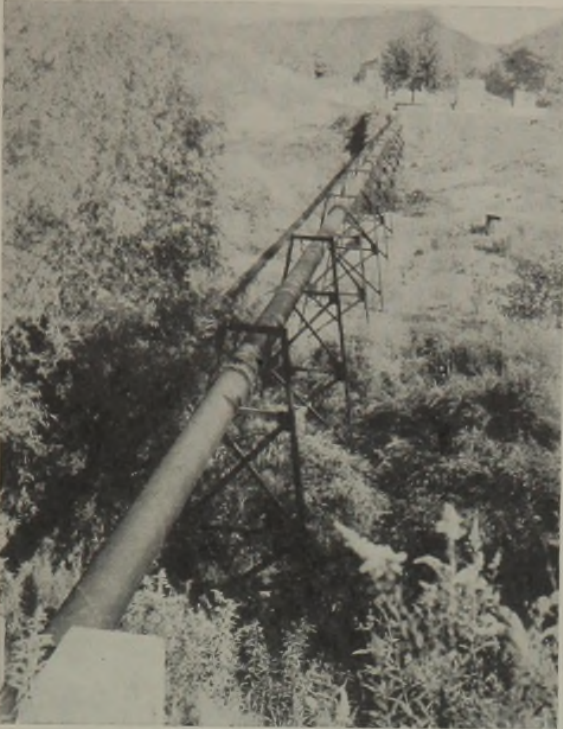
Outball sewer at Brighton, N. Y. 13 inch steel line joined with Dresser couplings.
